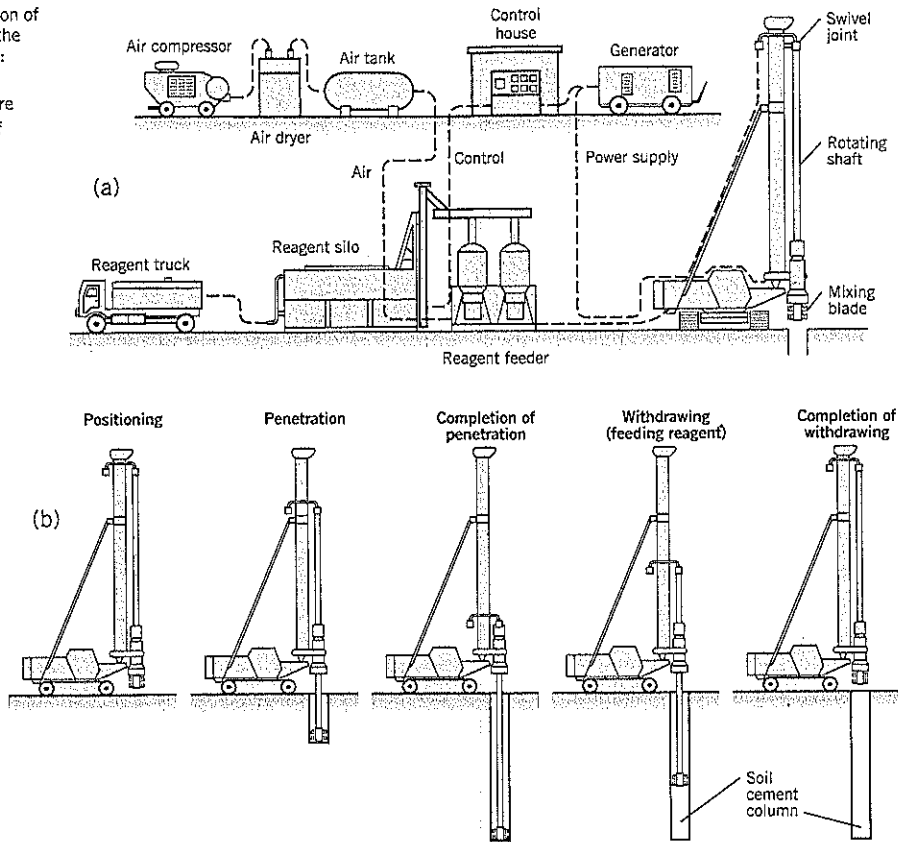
Schematic layout of a deep soil mixing batch plant (after Bahner and Naguib, 1998).
